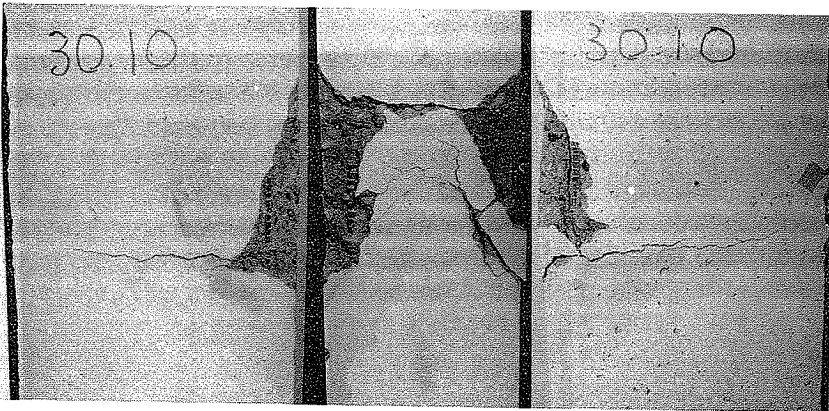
Failure of S.B.-specimen No. 30/10.
